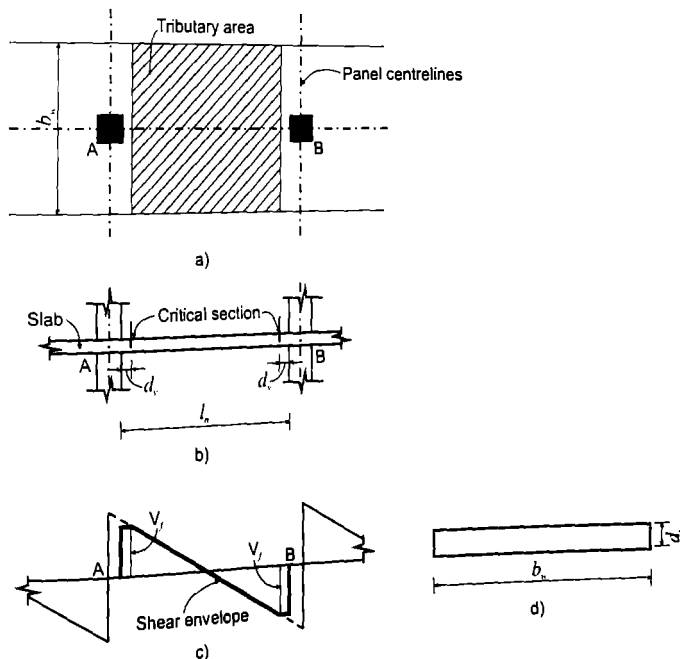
One-way shear design of two-way slabs: a) a plan view showing the tributary area; b) slab elevation showing the critical section; c) shear force envelope, and d) a typical slab cross-section for one-way shear design.
